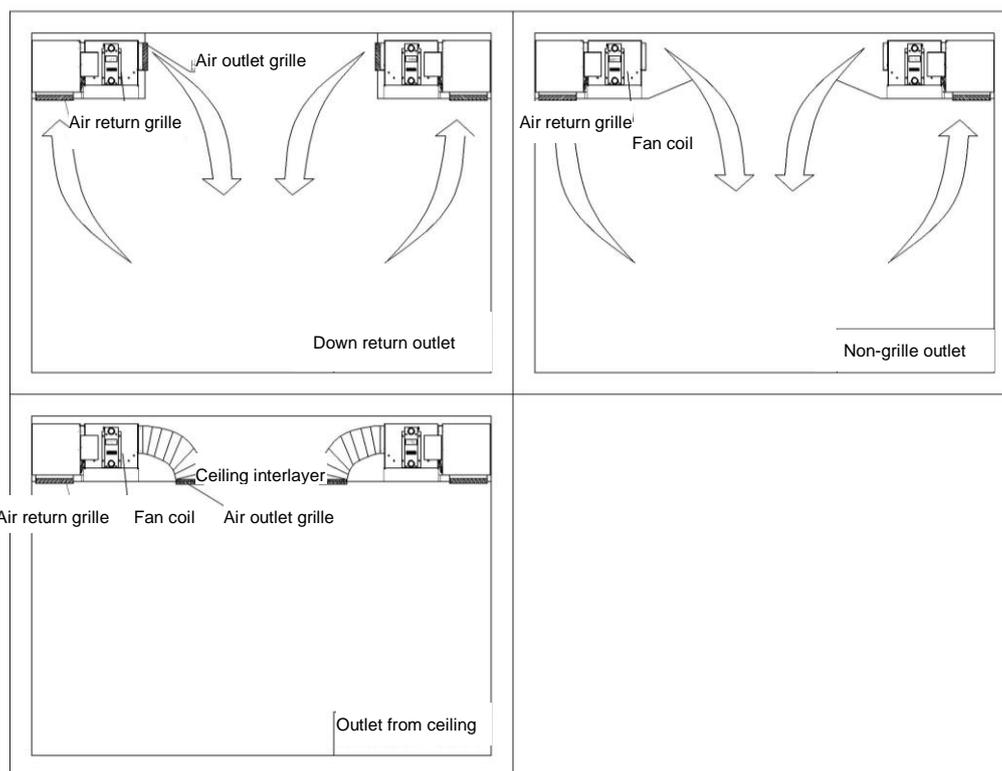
Installation diagram of roof-top fan coil of split air conditioner
